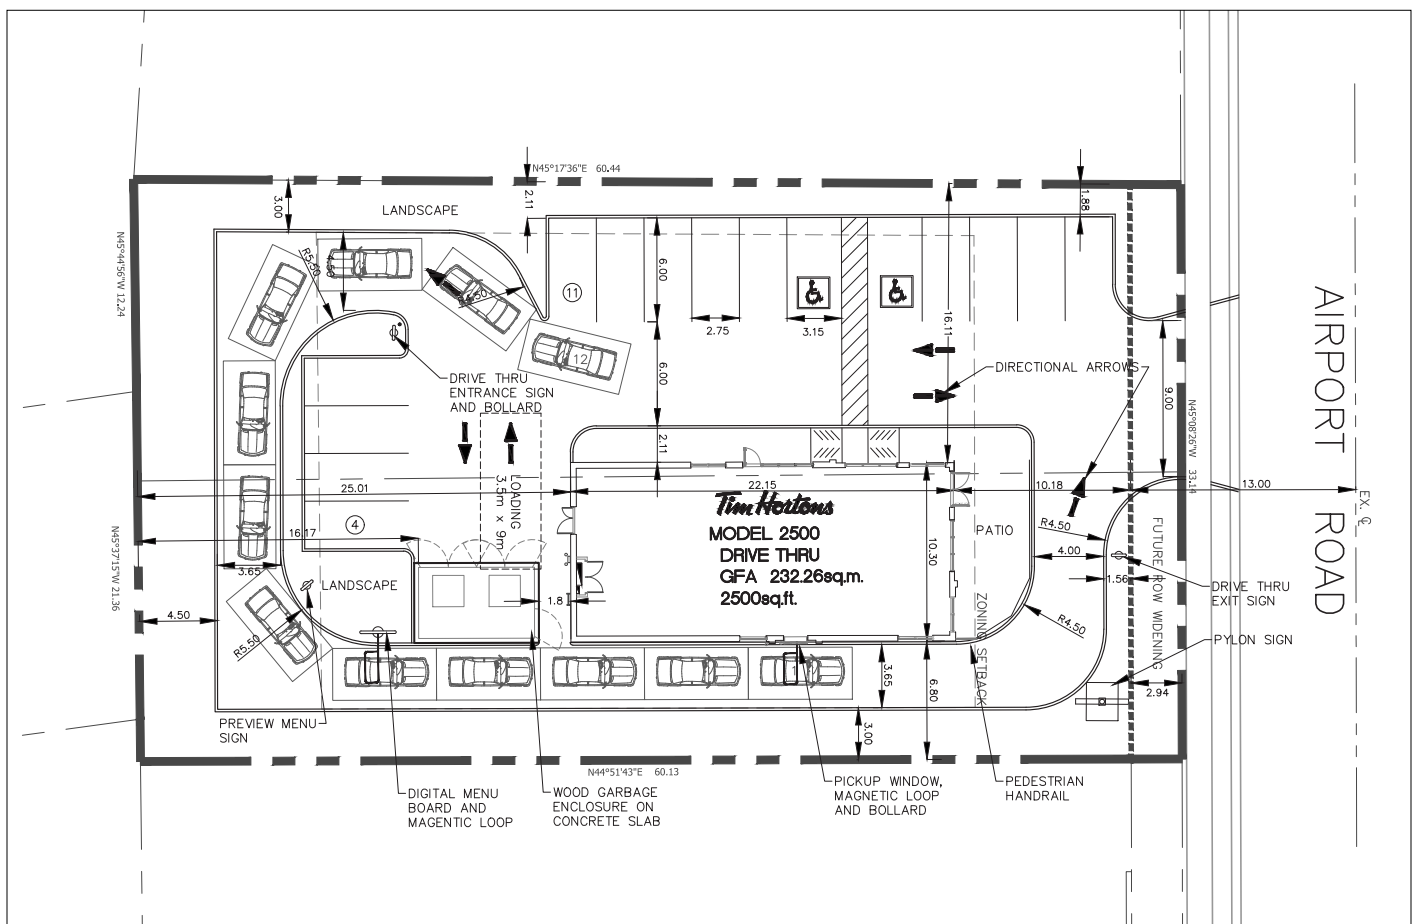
Proposed Site Plan prepared by Dillon Consulting
